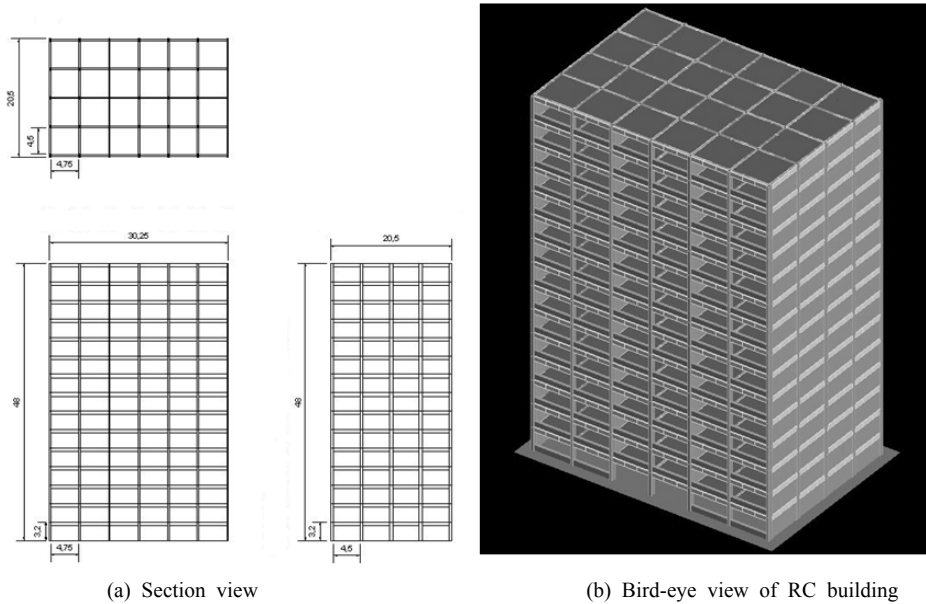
Plan and 3D model of 15 story RC building(unit: m).
